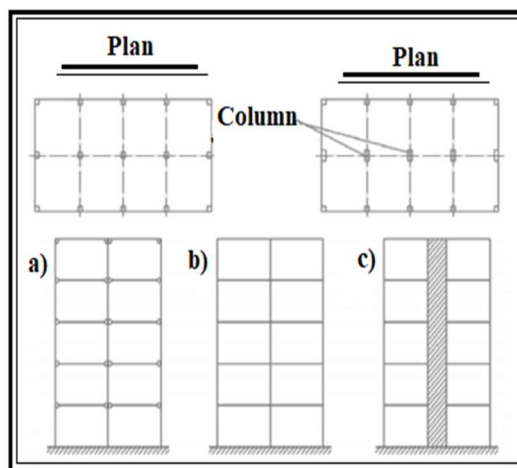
Construction scheme of framed building: a – cantilever; b – framed; c – frame-pylon
